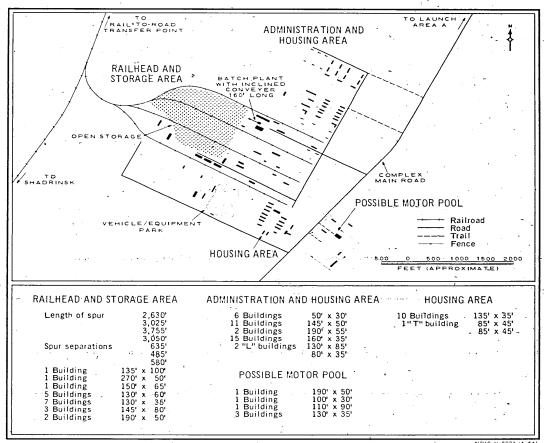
LAYOUT OF COMPLEX SUPPORT FACILITY.
